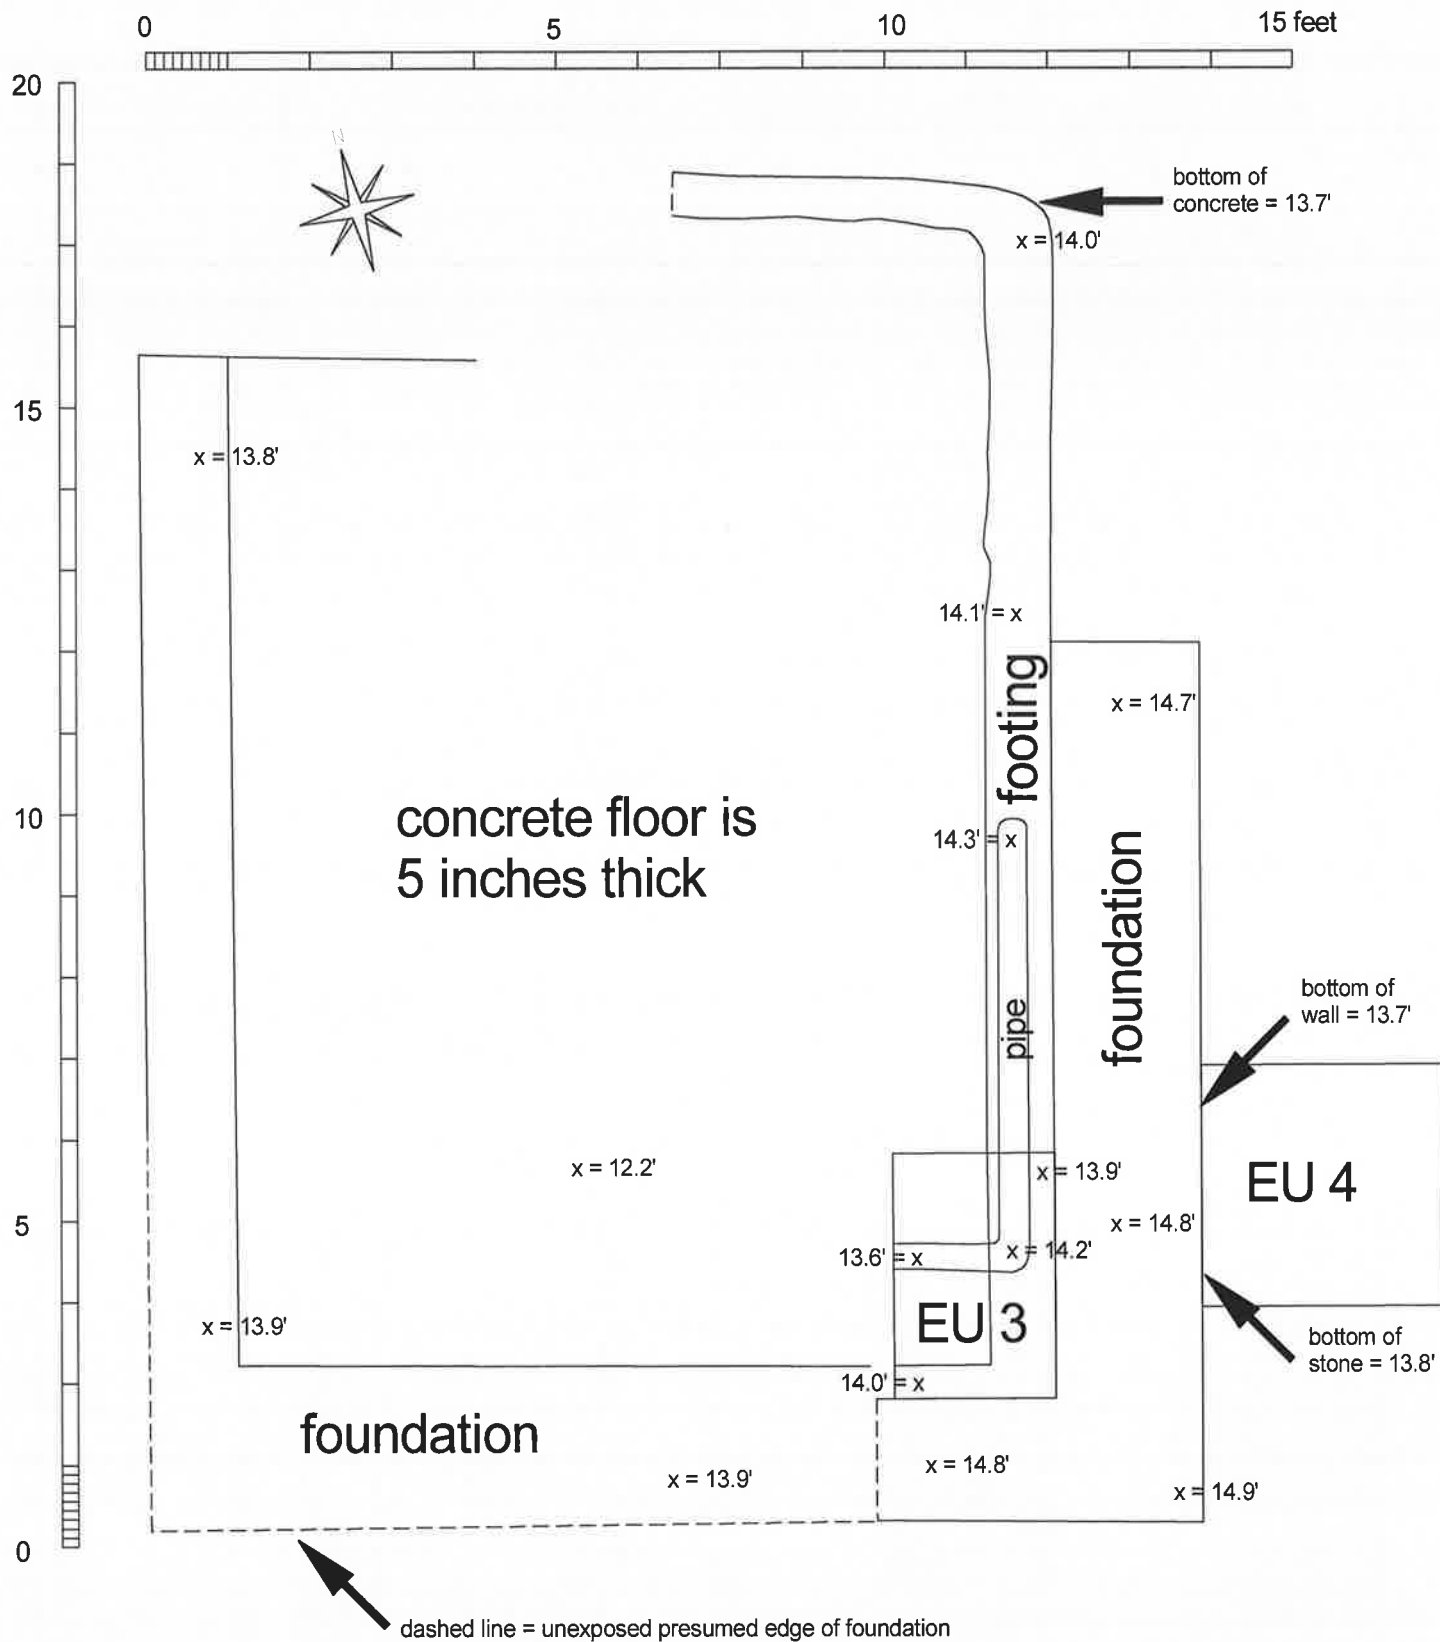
Plan view of Feature 2 also showing the location of archaeological excavation units (Soissons Zone, Tile1).
